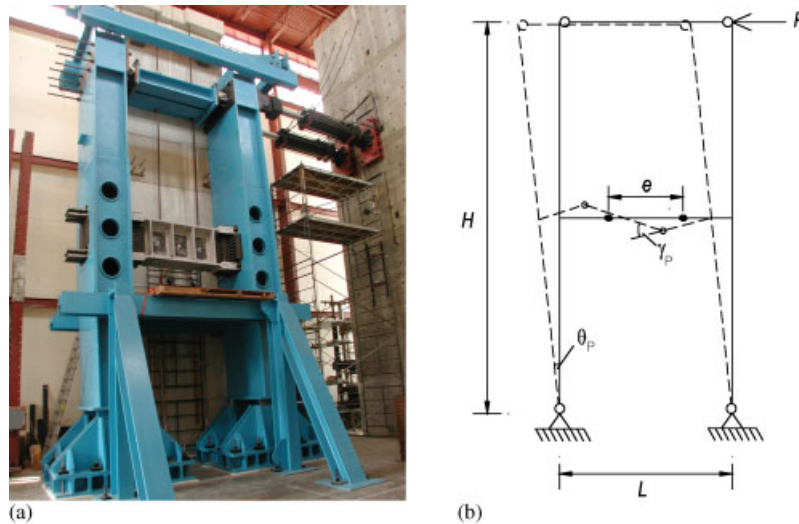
Shear link test set-up: (a) overall view; and (b) test setup geometry.
